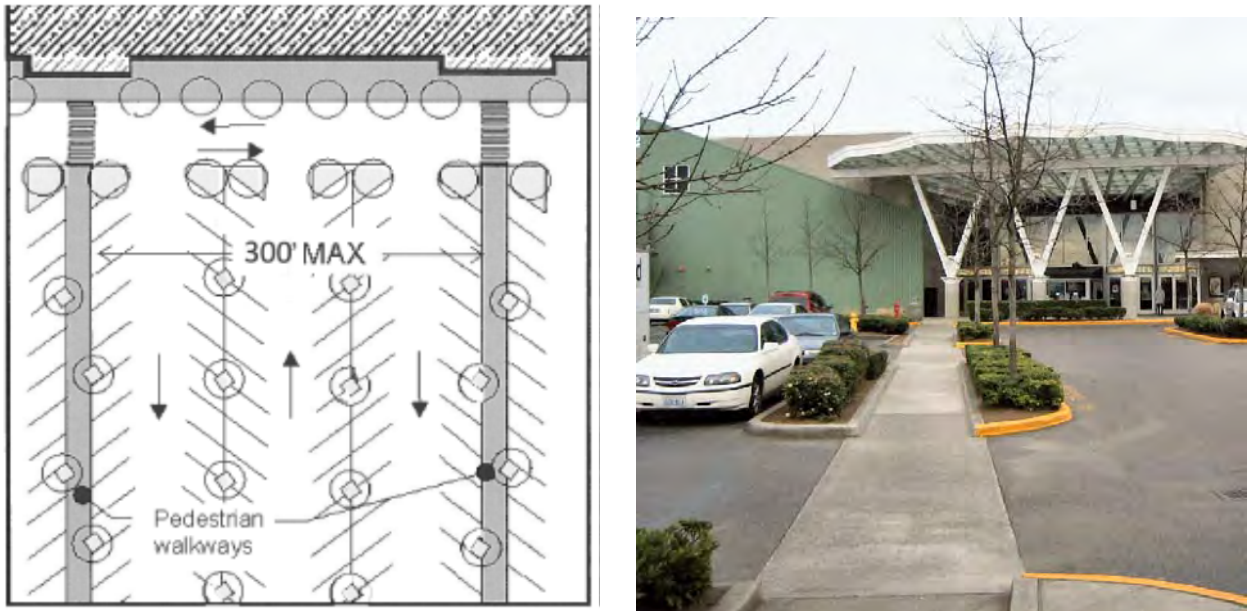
Example of good internal pedestrian circulation. Note connections from the street, between buildings and through parking lots
